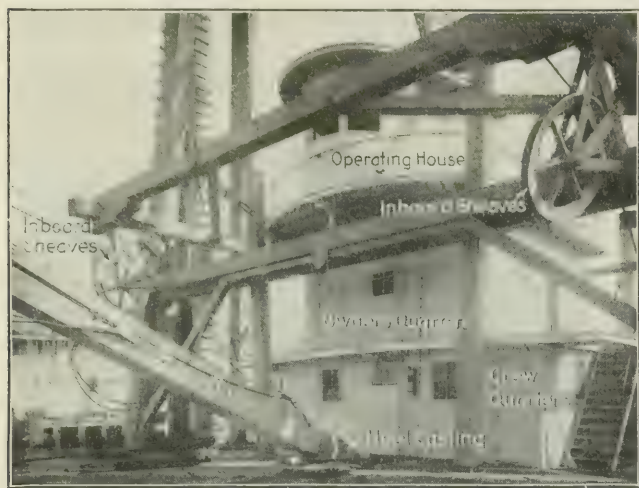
OPERATING END OF CLAMSHELL DREDGE
